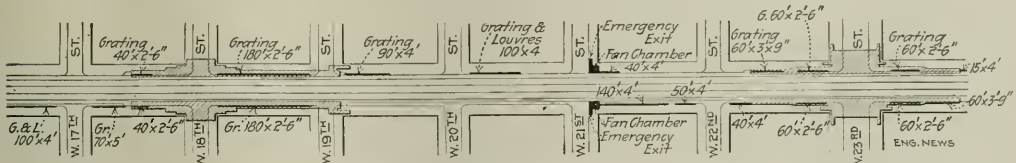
PLAN OF PORTION OF SEVENTH AVE. SUBWAY, SHOWING PROVISION FOR VENTILATION
